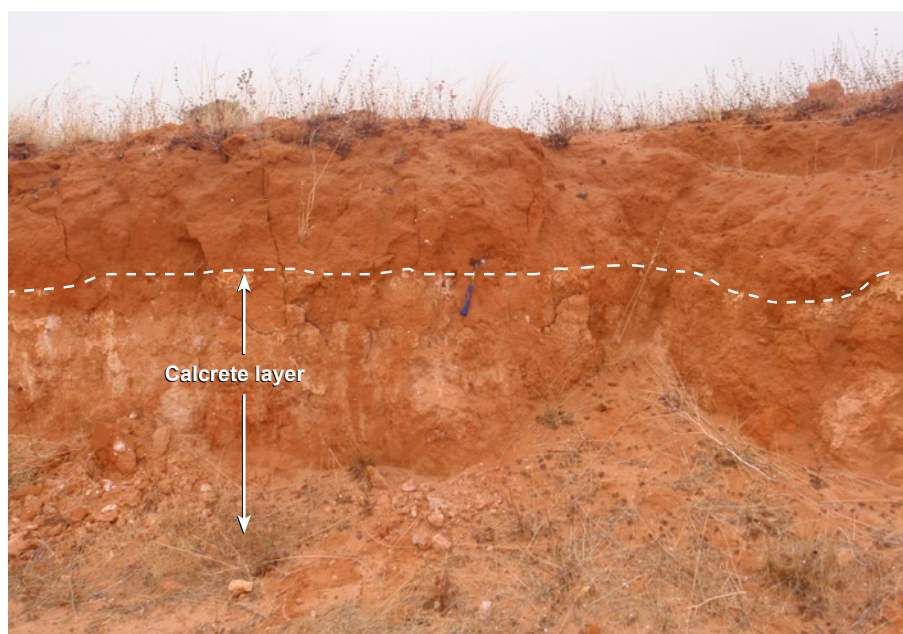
(Right): Calcrete layer exposed in the wall of a borrow pit located in the project area.
